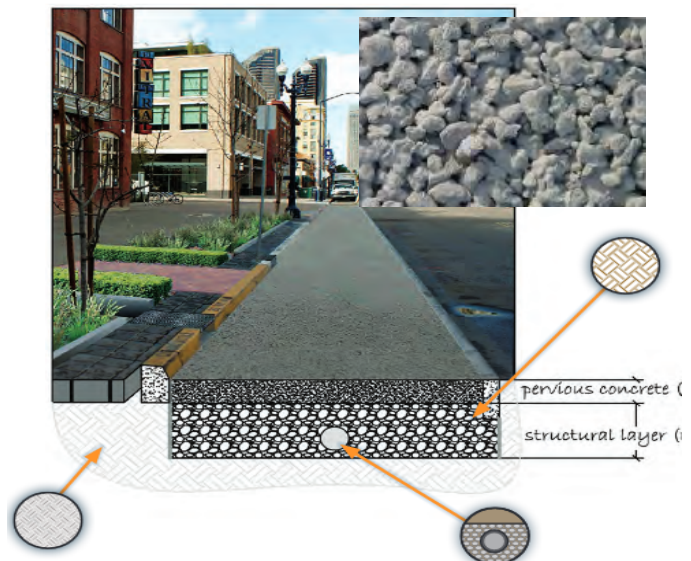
Permeable Pavement Sidewalk (Tetra Tech Inc., 2011)
